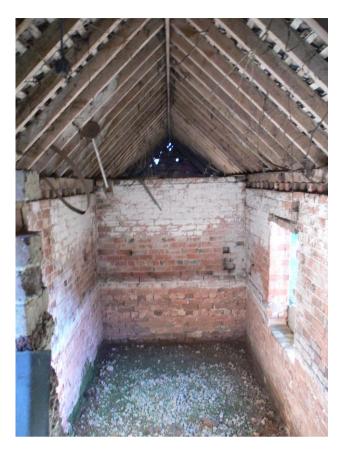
Internal view W showing gable wall of pigsty range with evidence of raised floor level
